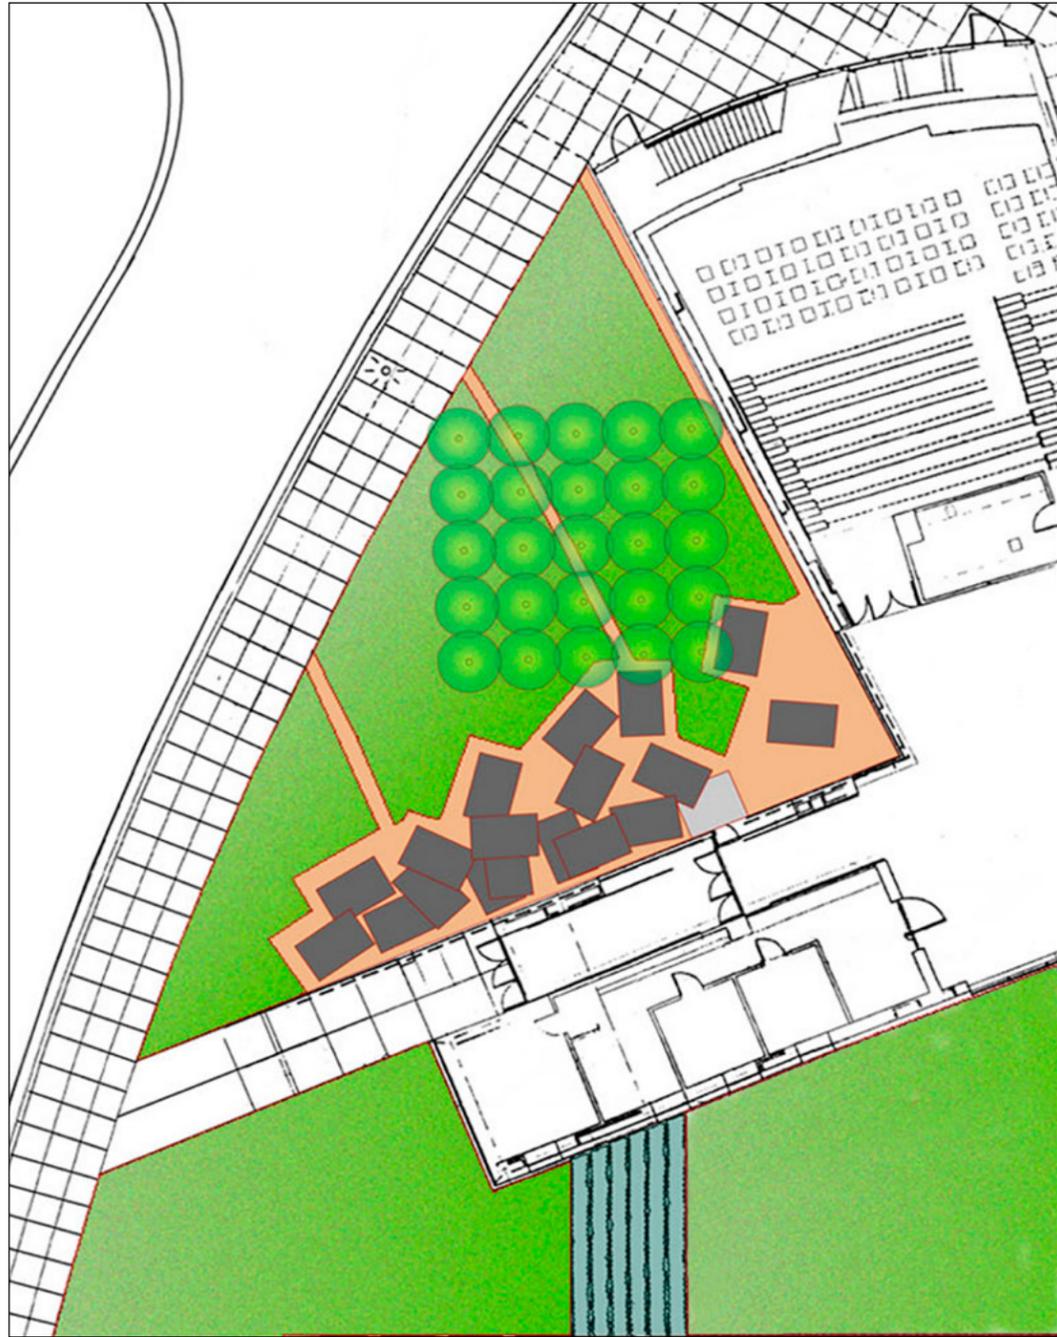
West Garden, Rapson Hall, study for proposed, *Site Index*, installation of anorthositic gabbro elements bosque of MN oak trees. Computer graphic by John Roloff on architectural site plan by Steven Holl Architects, circa, 2004.
